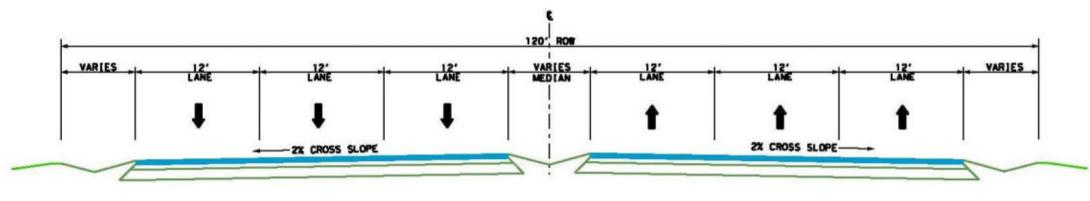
Typical Section – P6D and M6D Six Lanes Divided with Median
